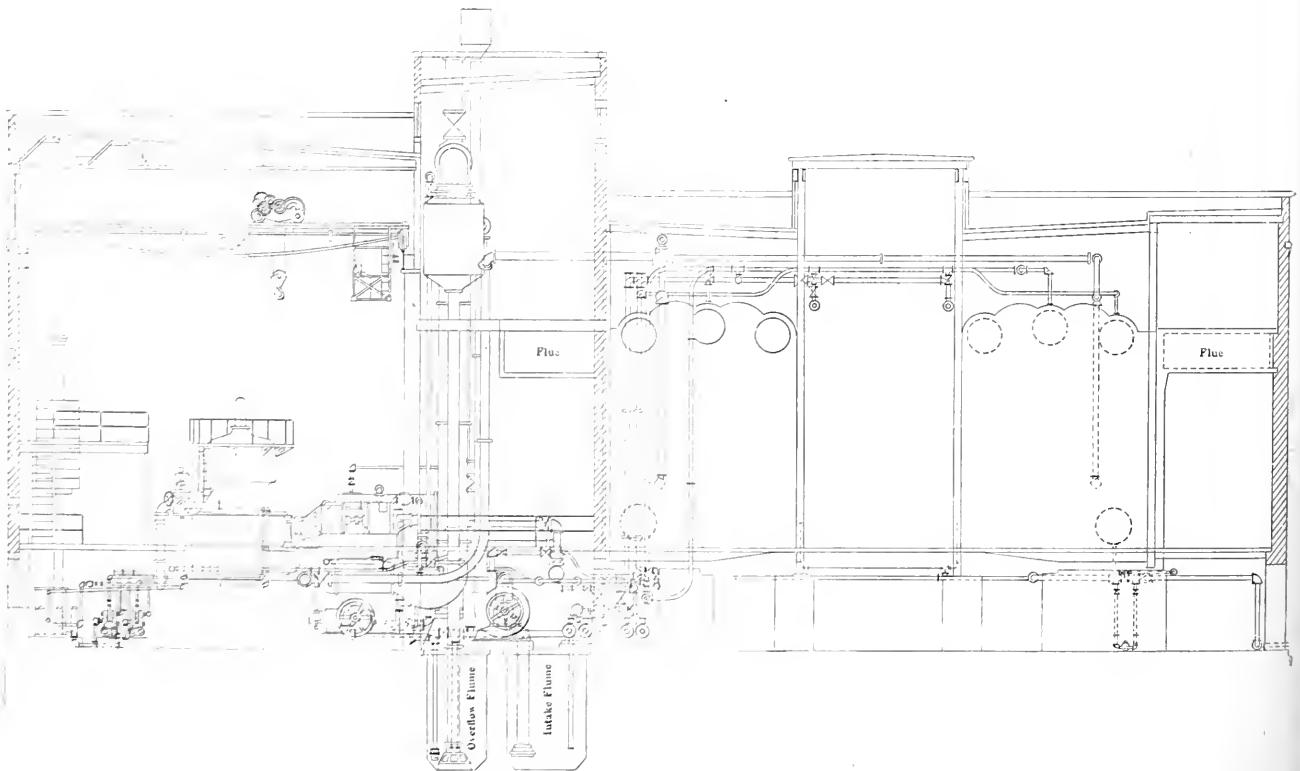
SECTIONAL ELEVATION THROUGH PLANT
